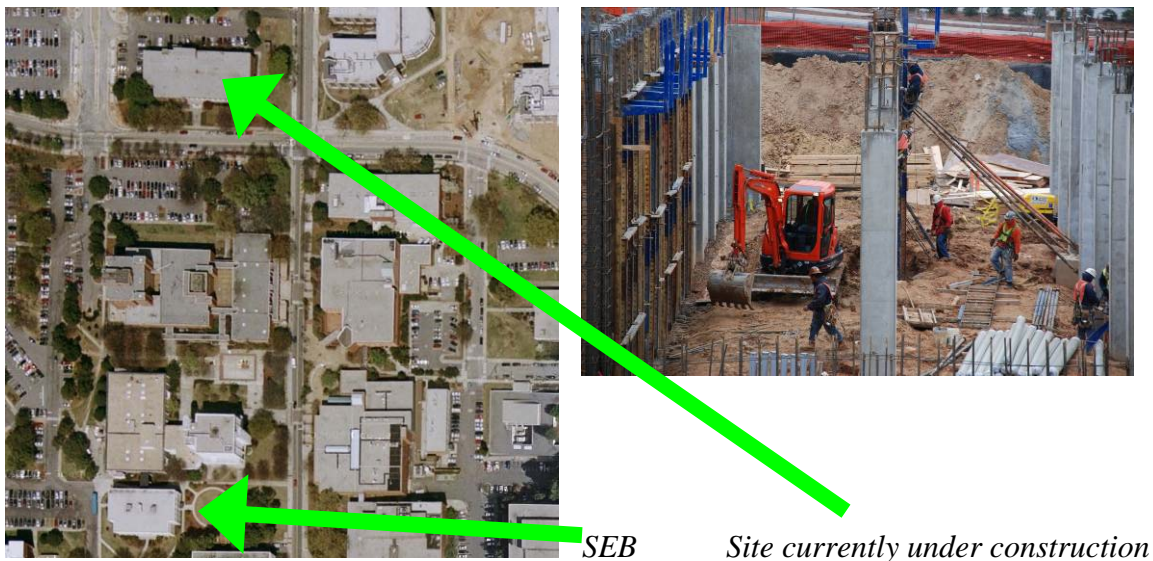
Location on Georgia Tech's campus (RAPIDS laboratory in the Sustainable Education Building (SEB), Structural Laboratory, and nearby construction site for Nanotechnology building), reinforced structures require 1W tags
